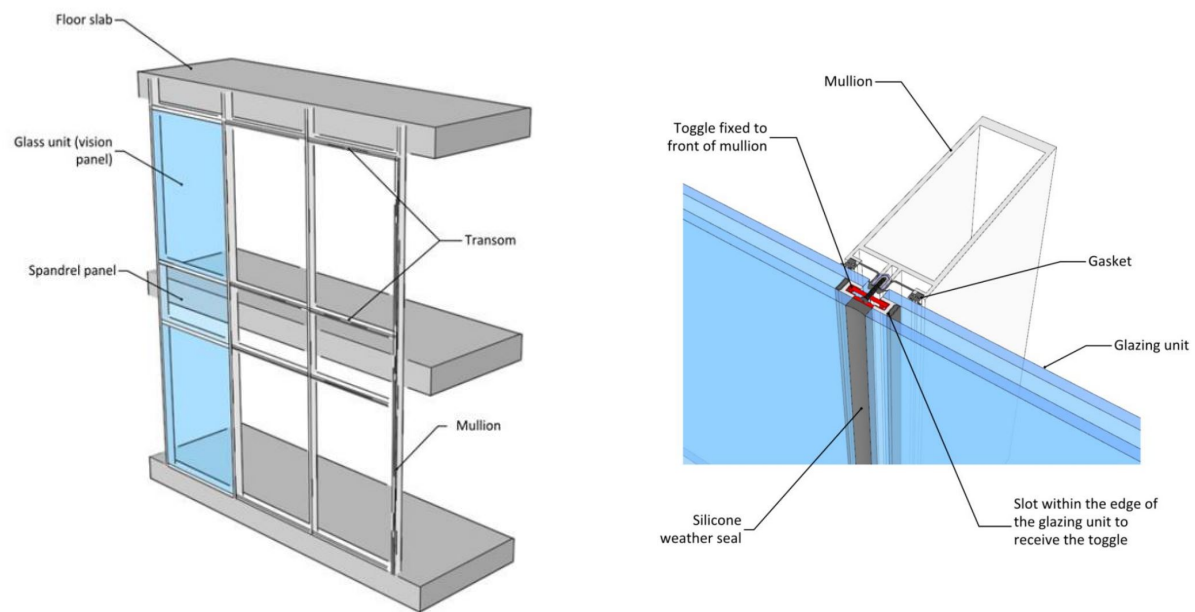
Stick-system of a curtain wall facade which uses a toggle connection [84]
